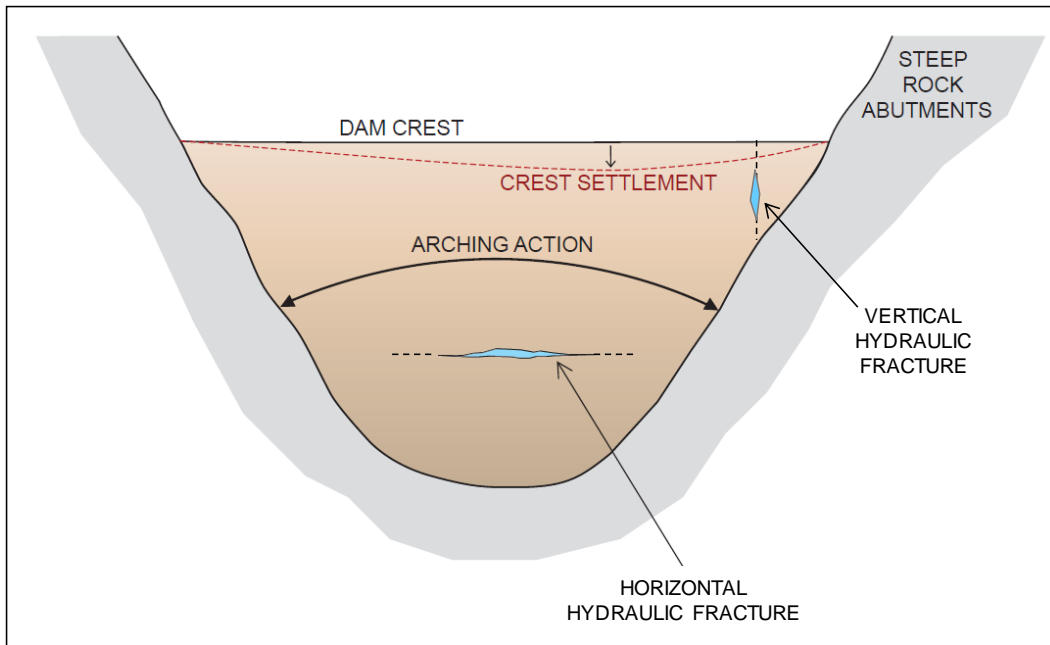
C-4 Cracking and Hydraulic Fracture due to Cross-Valley Arching and Steep Abutment Slopes (Courtesy of Mark Foster)
